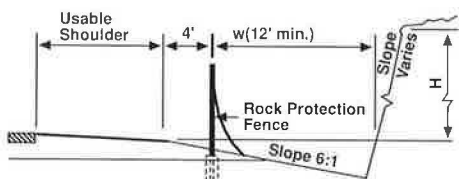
Roadway section on rock slope—Design A, Stage 2.
